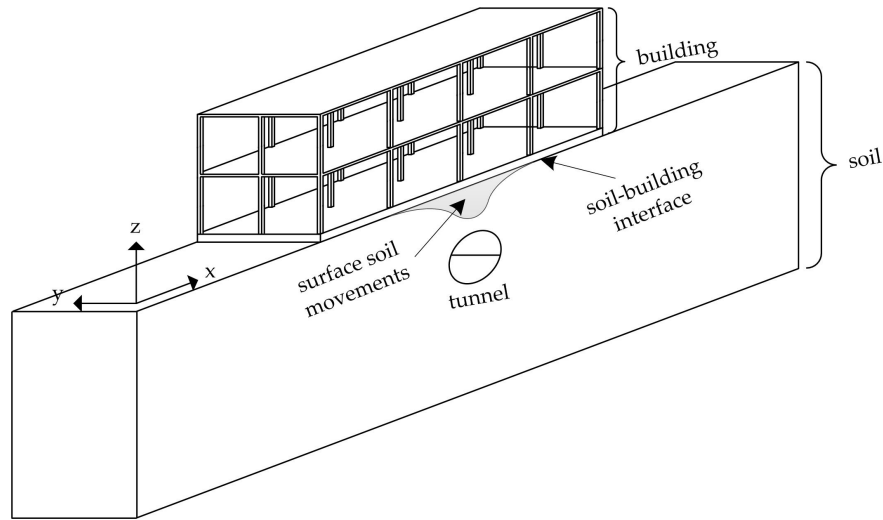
A generic model of tunnel–soil–building interaction problem
